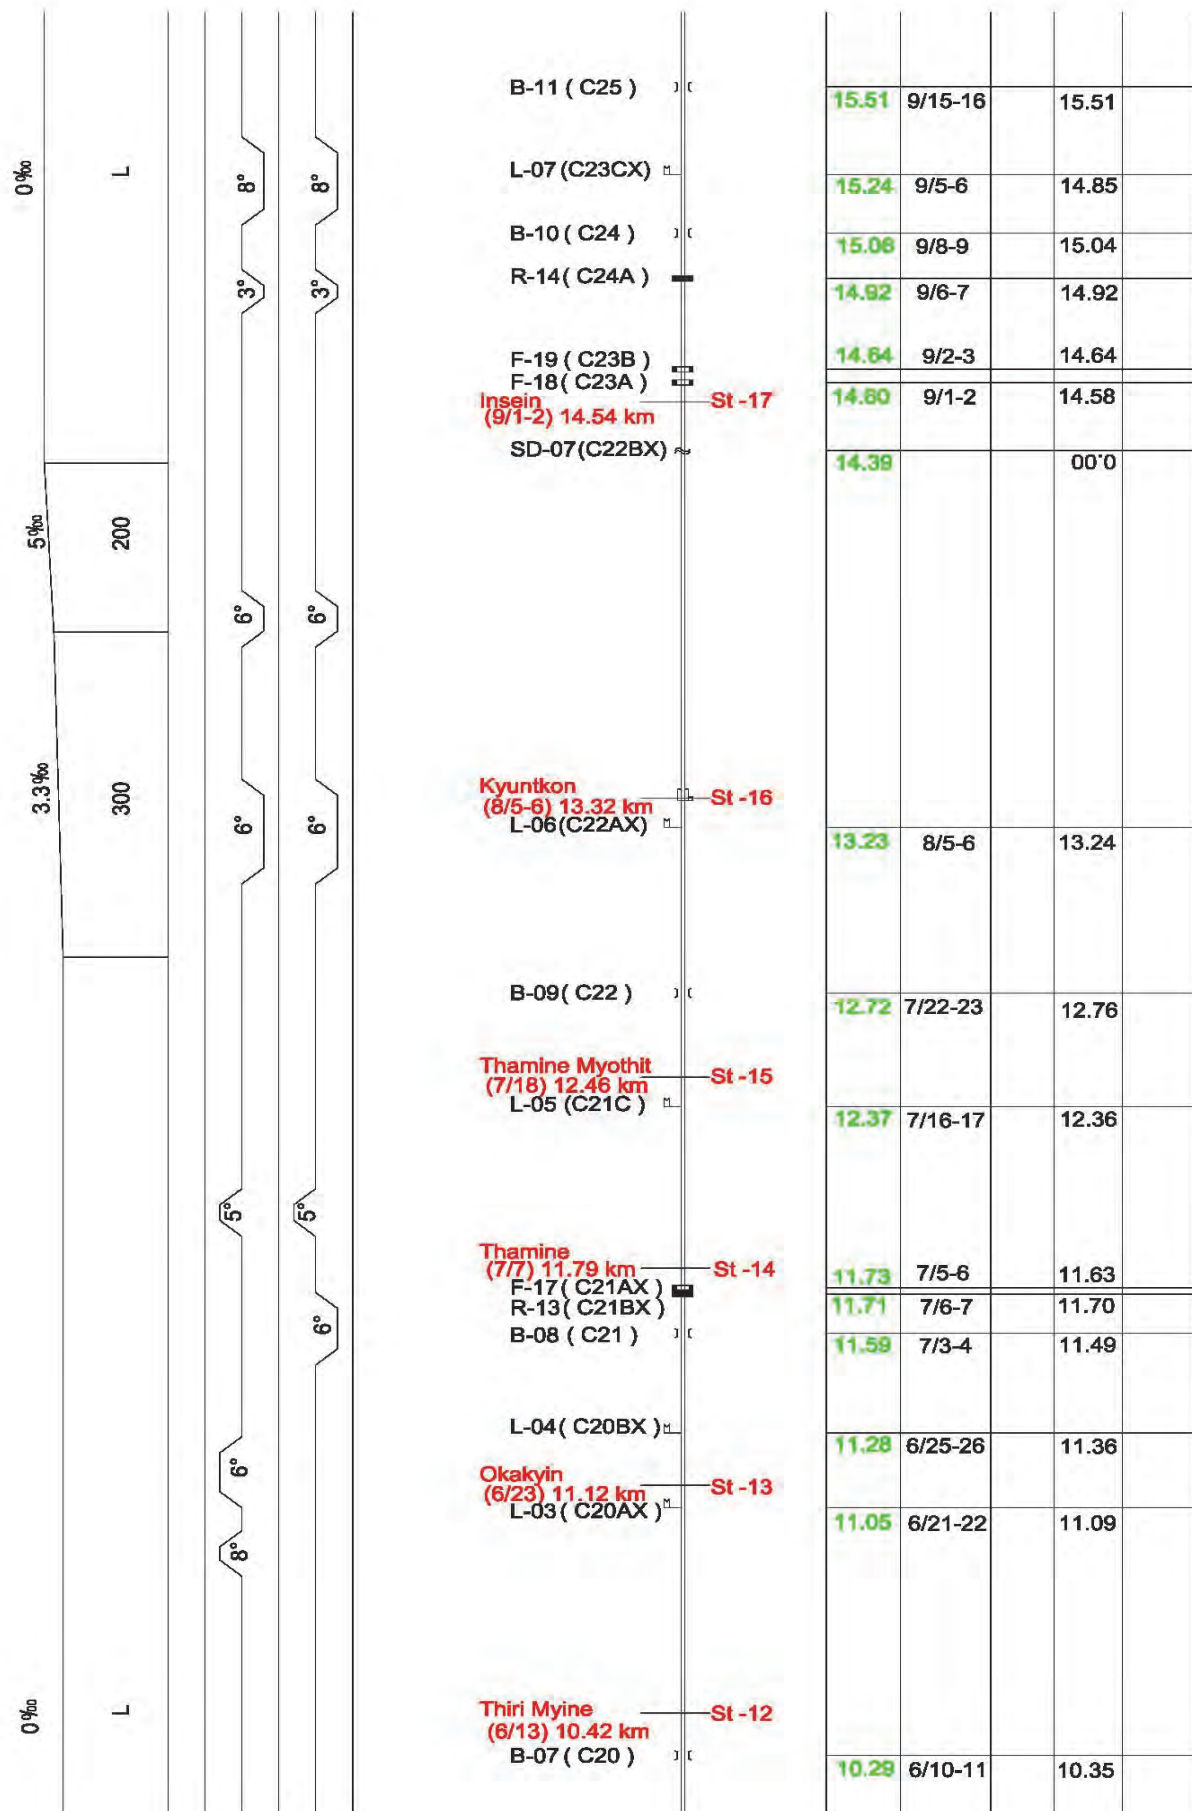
Schematic Sketch on Existing Yangon Circular Railway (3/9)
